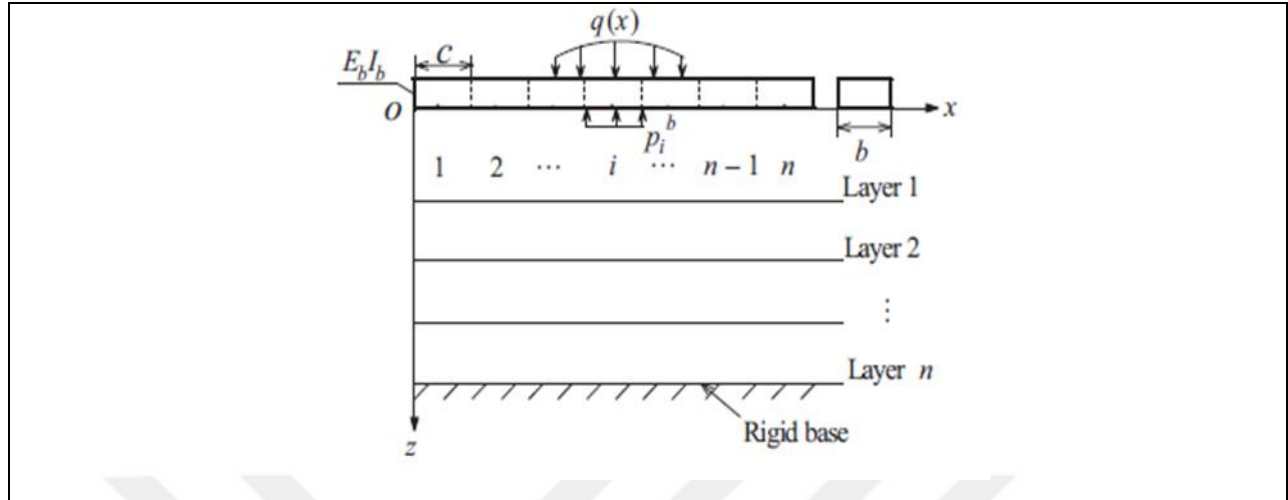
3: Elastic Foundation Beam Resting on Multilayered Soils[3]
